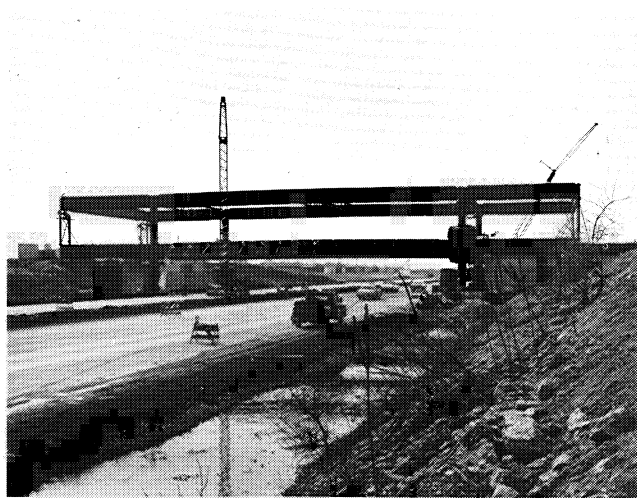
The Abraham Lincoln Oasis has no center support, leaving a 135-ft clear span. Four cruciform columns with 32 butt welds support the entire structure
